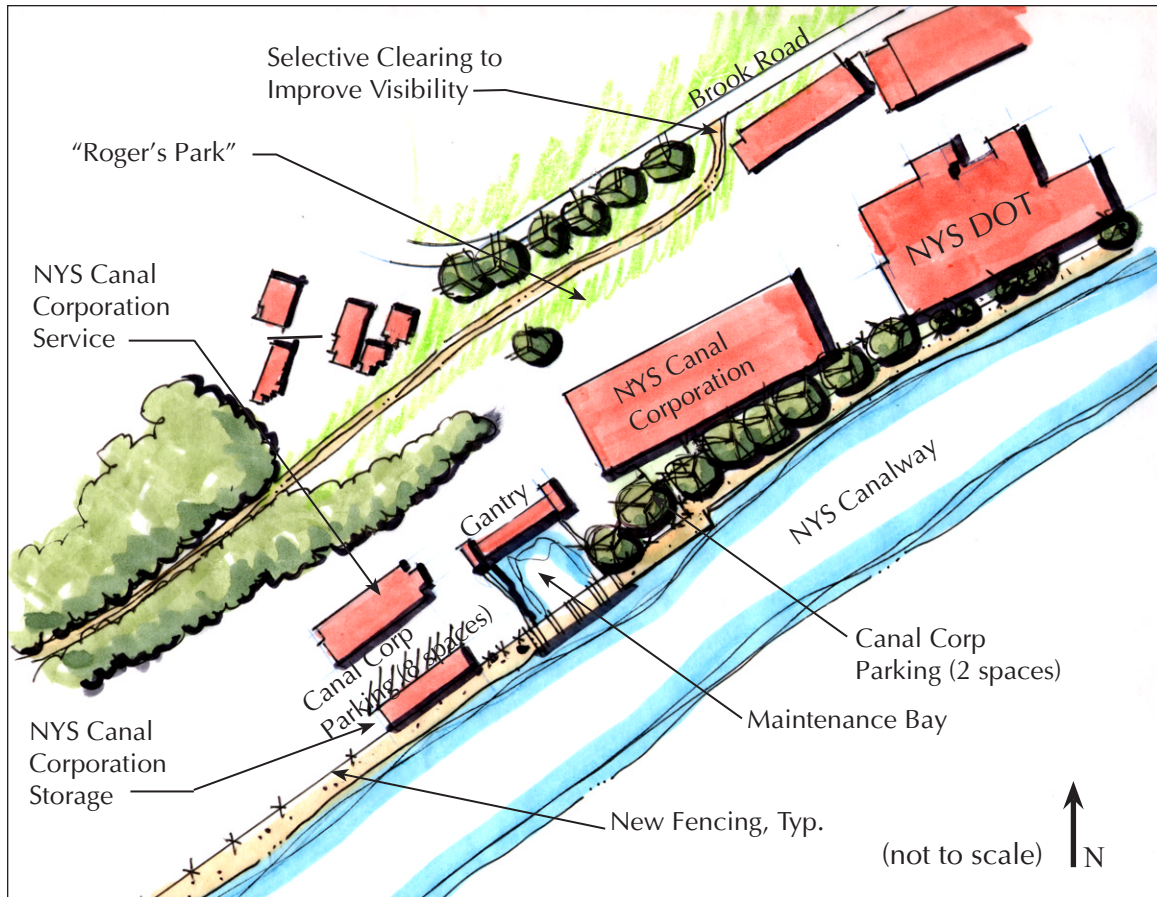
Enlargement of Recommended Improvement Plan Showing Trail Extension through Roger's Park with "T" Intersection at Brook Road and Improvements along the Canal
